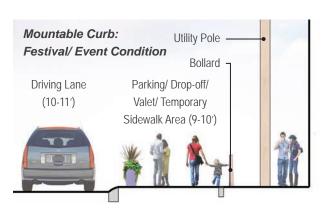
Flexible Use Zone with Mountable Curb Concept Section, For Illustrative Purposes Only, The raised parking/drop-off area with mountable curb concept will likely only be possible along Maryland Avenue and lower Main Street where curb lines can be potentially shifted with the removal of the four buildings as part of EC Safe and Sound.
